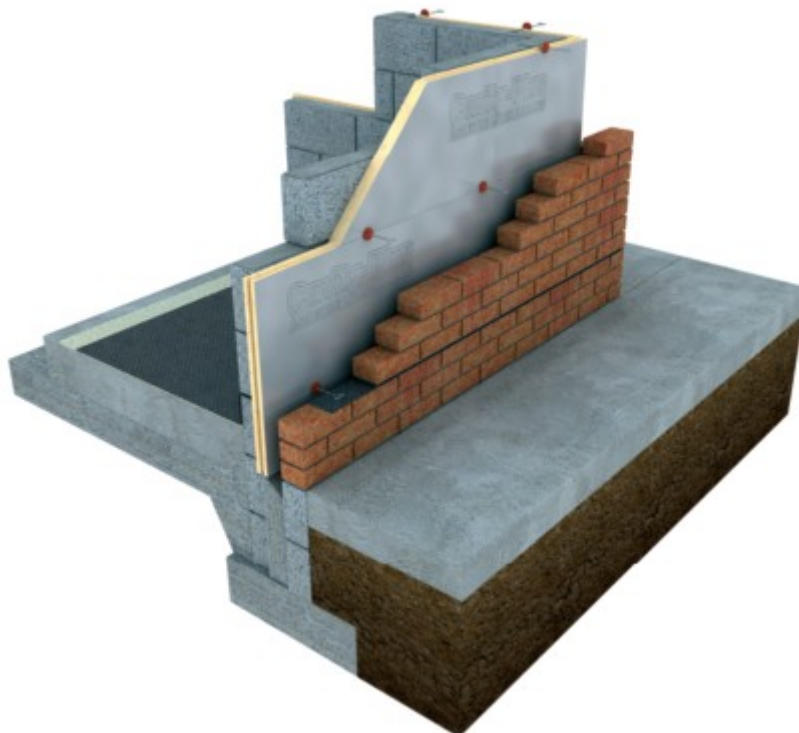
Xtratherm Cavity-Plus Partial Fill Cavity Wall Insulation Board installed with brick outer leaf and block inner leaf
